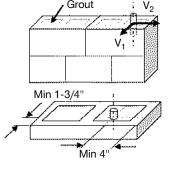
KWIK Bolt 3 installed in the top of masonry walls
